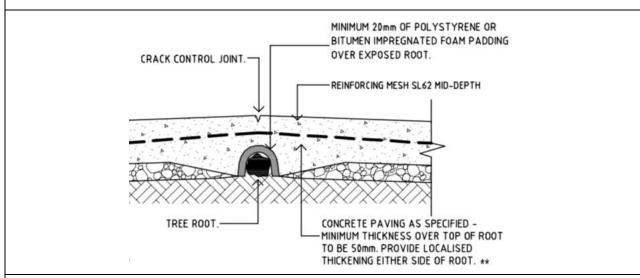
Example method for bridging concrete footpaths over tree roots provided in the Canterbury Bankstown Council standard drawings.⁸
